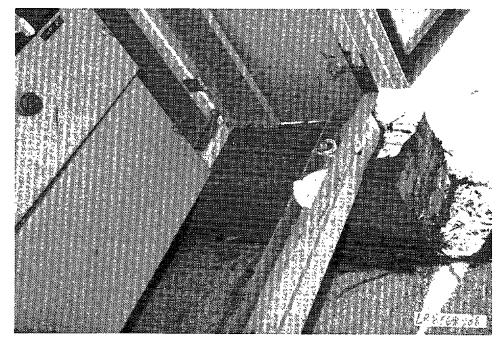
This roof-mounted MCC at a manufacturing facility, affected by the 1989 Loma Prieta Earthquake, pulled its anchorage. The anchorage design of the two-section unit used 3/8-inch lag bolts into wood.
